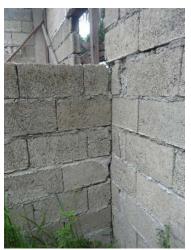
Inadequate masonry wall connections on Bohol. Each wall intersection should have a column with horizontal rebar dowels tying walls to the column.
